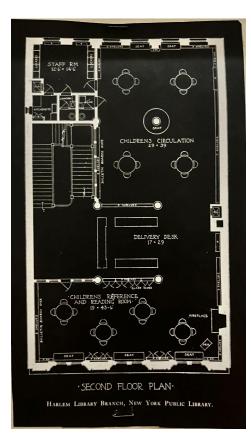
Second-floor plan of Harlem branch library. Thakore, A. V. Survey of the 115th Street branch of the New York Public Library, 1950.
